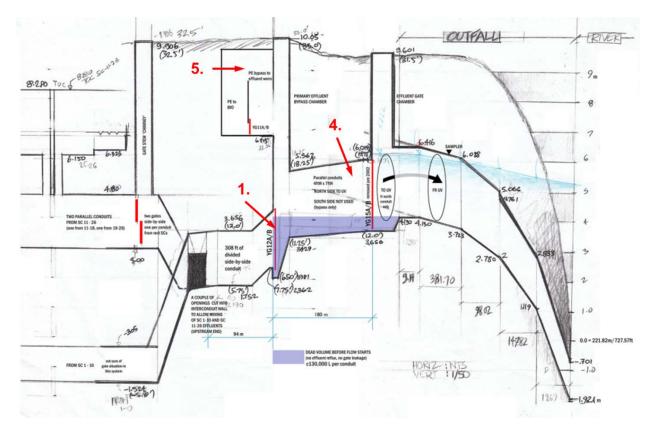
Profile through the Secondary Effluent and Outfall Conduits
